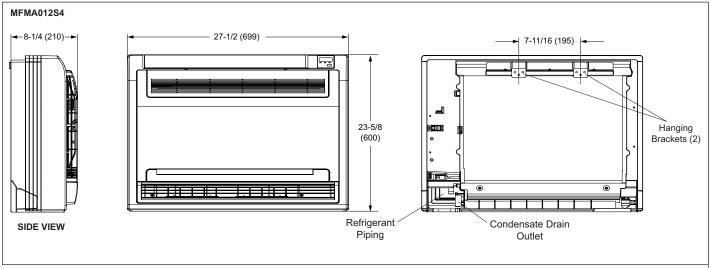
MFMA Indoor Unit Dimensions - Inches (mm)
